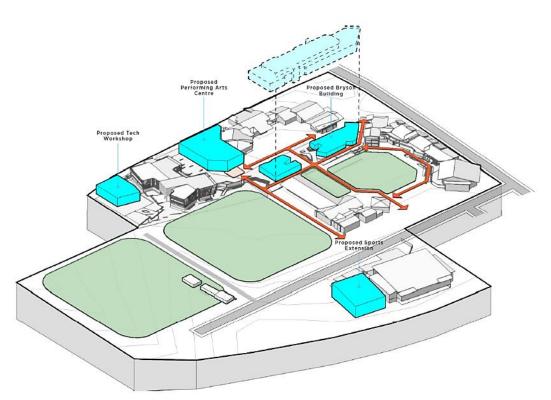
Concept Masterplan – a campus heart with connected meeting places and buildings (Source: PMDL)
